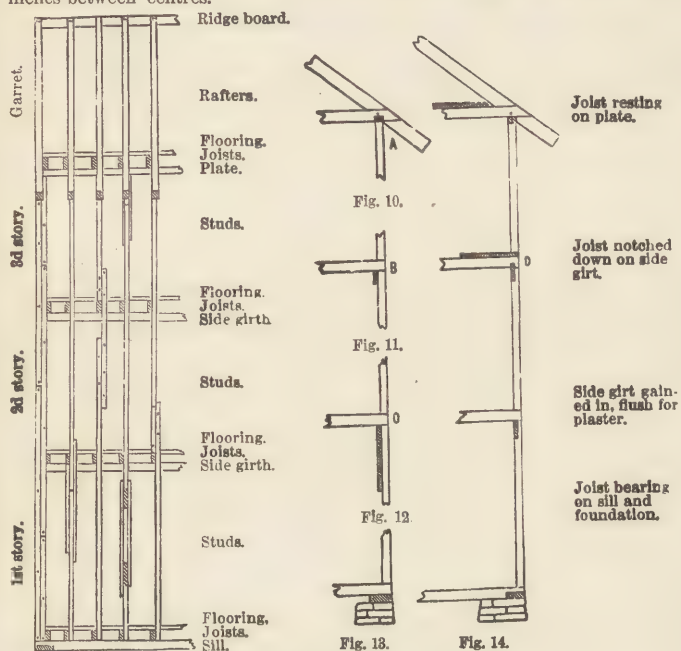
THREE STORY BUILDING. BALLOON FRAMING. DETAILS.
